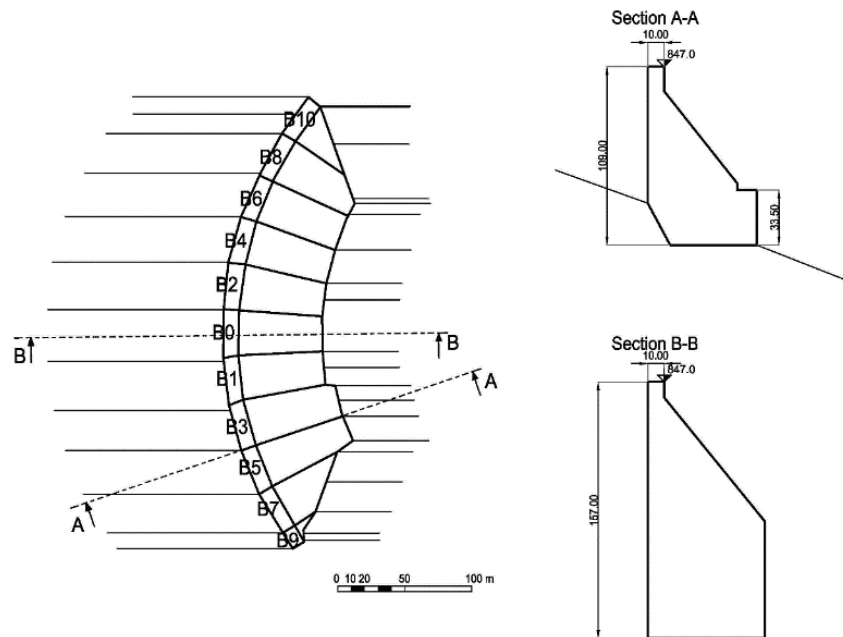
Plane view and cross sections A-A and B-B of Janneh dam.
